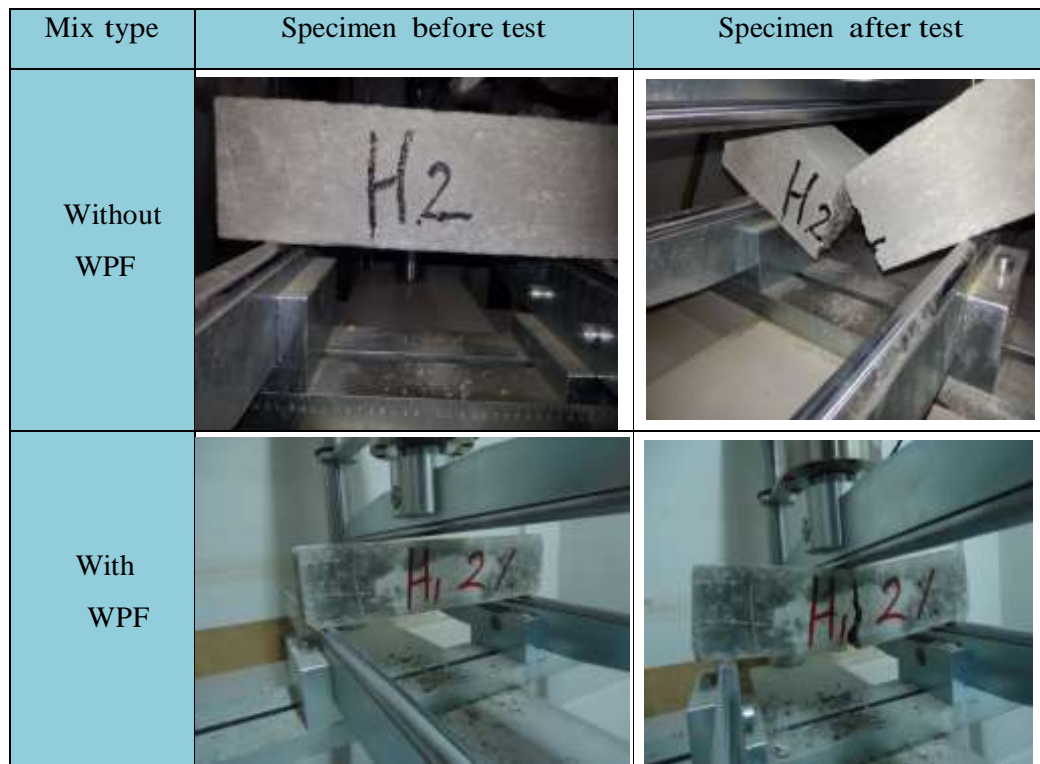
The 100x100x400 mm concrete prisms tested for modulus of rupture
